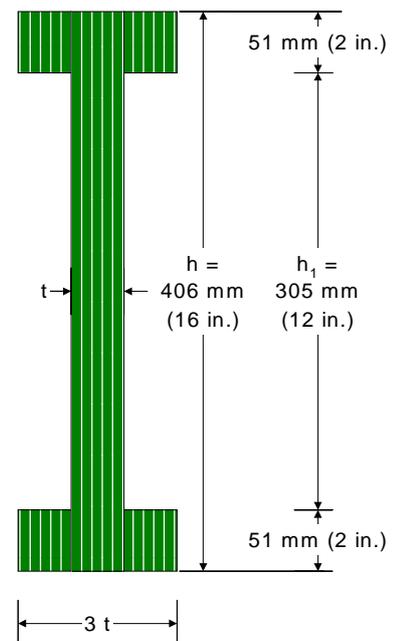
Specimen dimension used in APA full-scale edgewise shear tests ( $t = \text{LVL thickness}$ )
